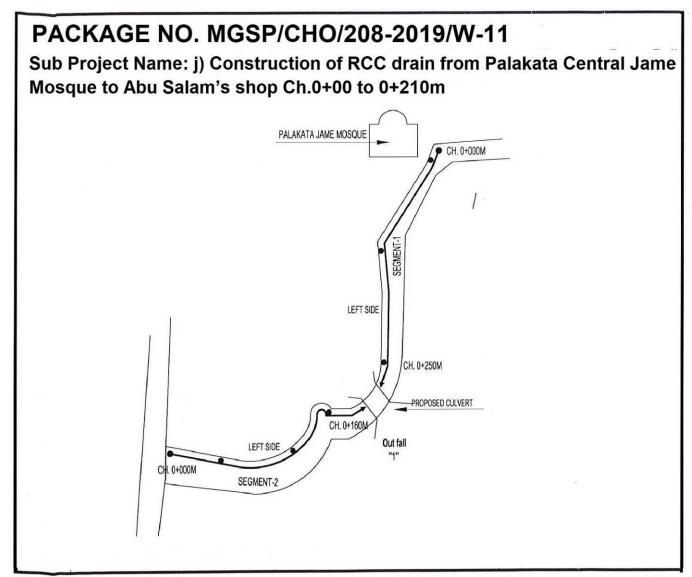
(j): Layout Plan of the proposed Subproject area from Palakata Central Jame Mosque to Abu Salam's shop
